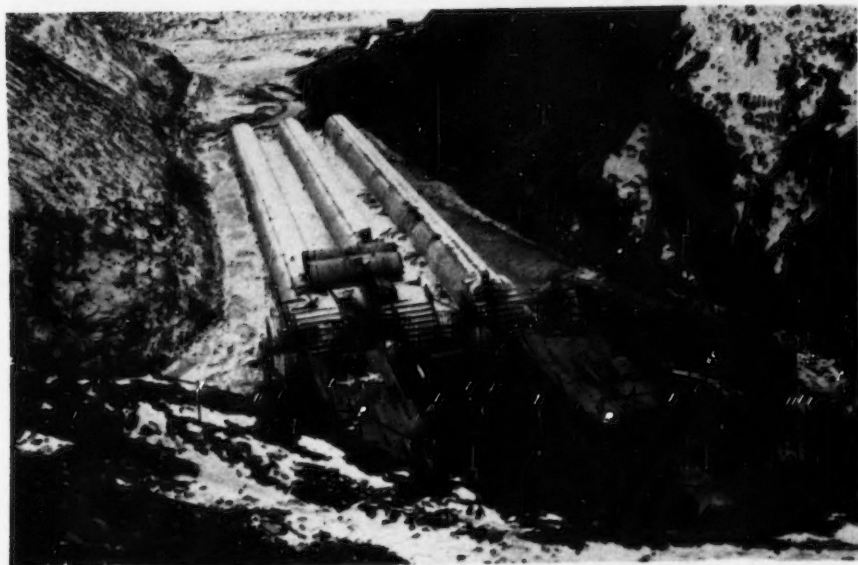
The stage of construction at the end of the first season, showing major excavation, the first few lifts in the plant and the heavier portion of the intake conduit complete.
